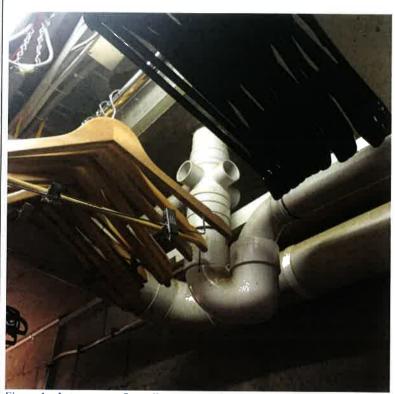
Intumescent fire collars are required to be post fitted to plumbing penetrations.
